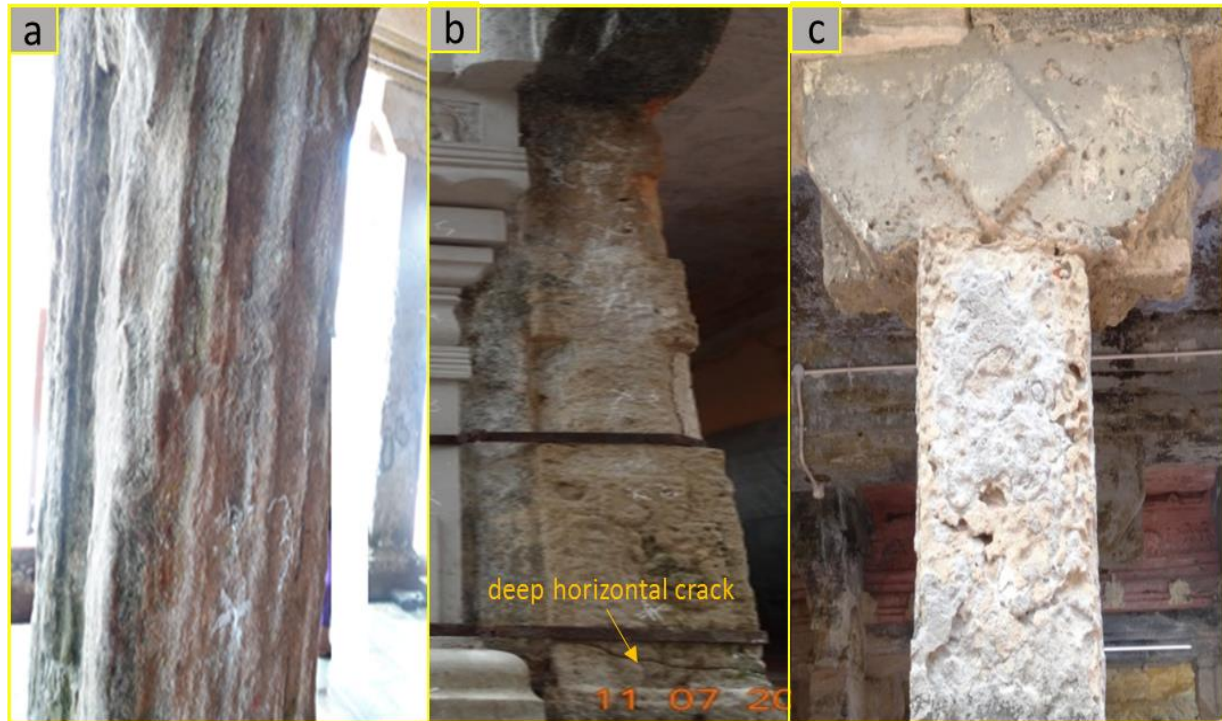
Examples of extreme damages in the columns (a) heavy ridging (b) deep cracking (c) fissures and loss of section
